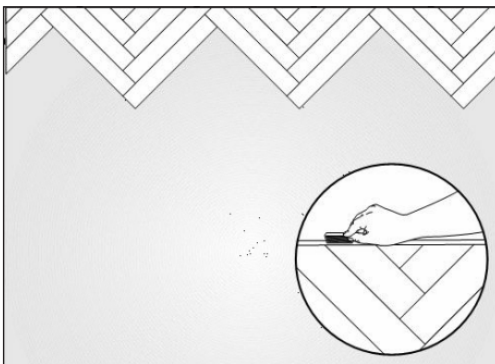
Put in spacers. Put in spacers between the flooring and the wall to ensure an expansion gap of 10/12 mm.
